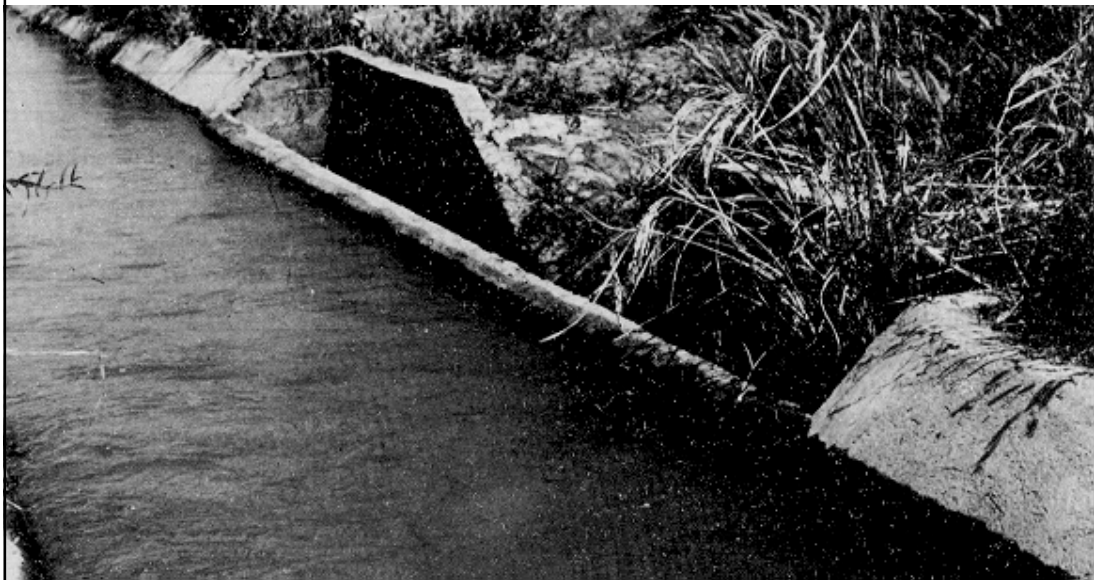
shows an emergency outlet. The water level is lower than the crest of the emergency outlet. An engineer should be consulted for the design and the installation of an emergency outlet.
